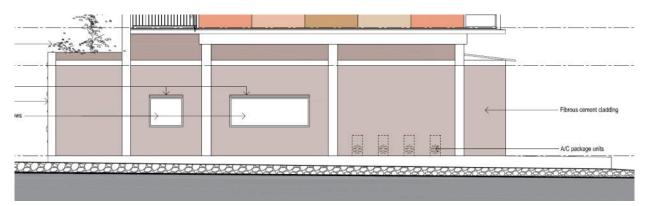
Extract of the western elevation (Source: Templum Design Architects)
